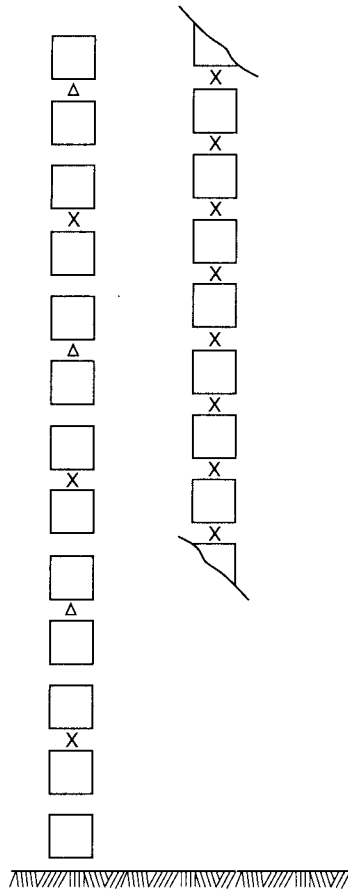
(a) In-rack sprinkler arrangement, Group A plastic commodities, storage height over 25 ft (7.6 m).
